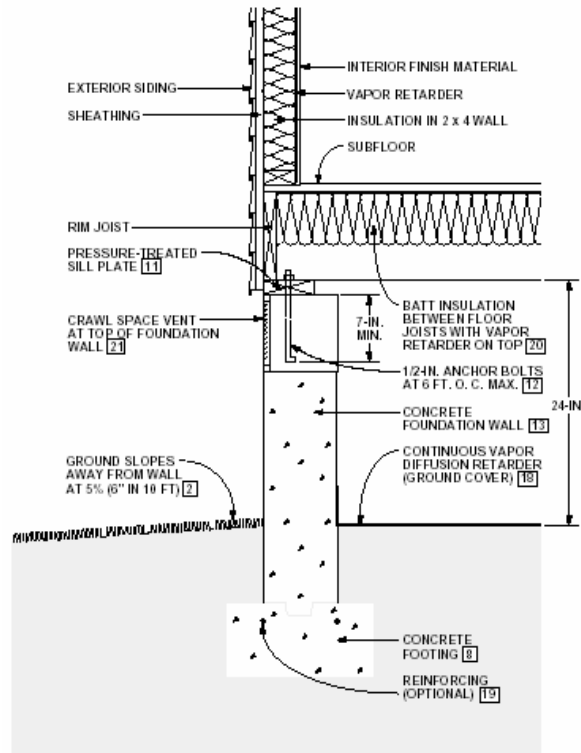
illustrates a vented crawl space with a concrete foundation wall. The insulation is placed between the floor joists over the crawl space. The crawl space floor is at the same level as the surrounding grade resulting in no major drainage concerns.
